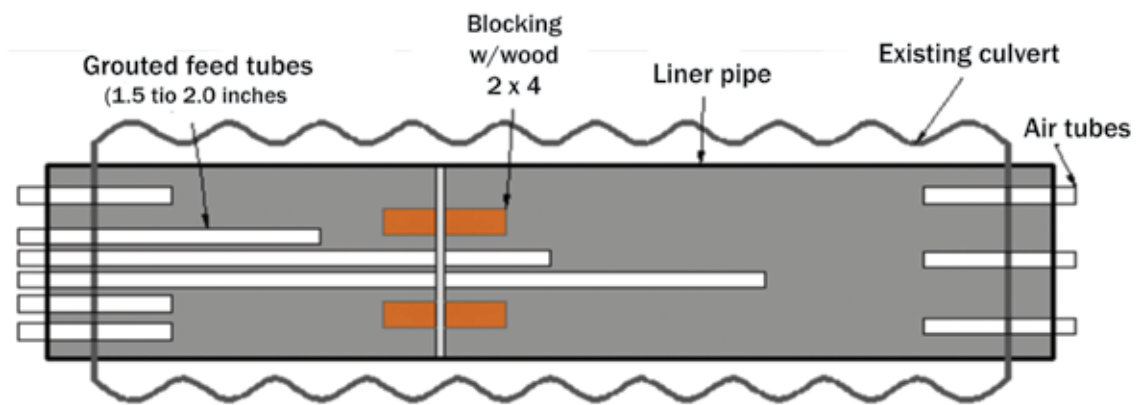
Typical plan view of a grouting setup when sealing the annular space between a host and liner pipe (courtesy Christina Neutz)
